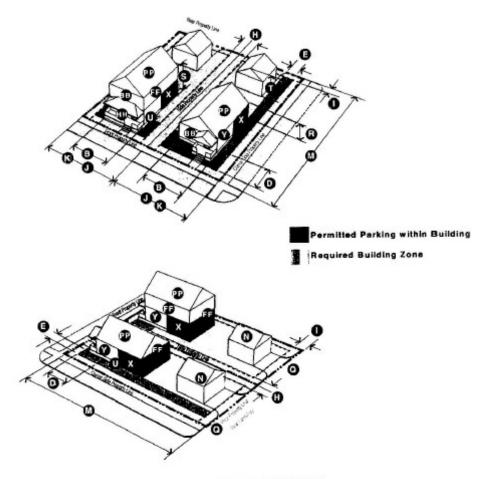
N SINGLE-FAMILY DETACHED BUILDING TYPE DIAGRAM.
